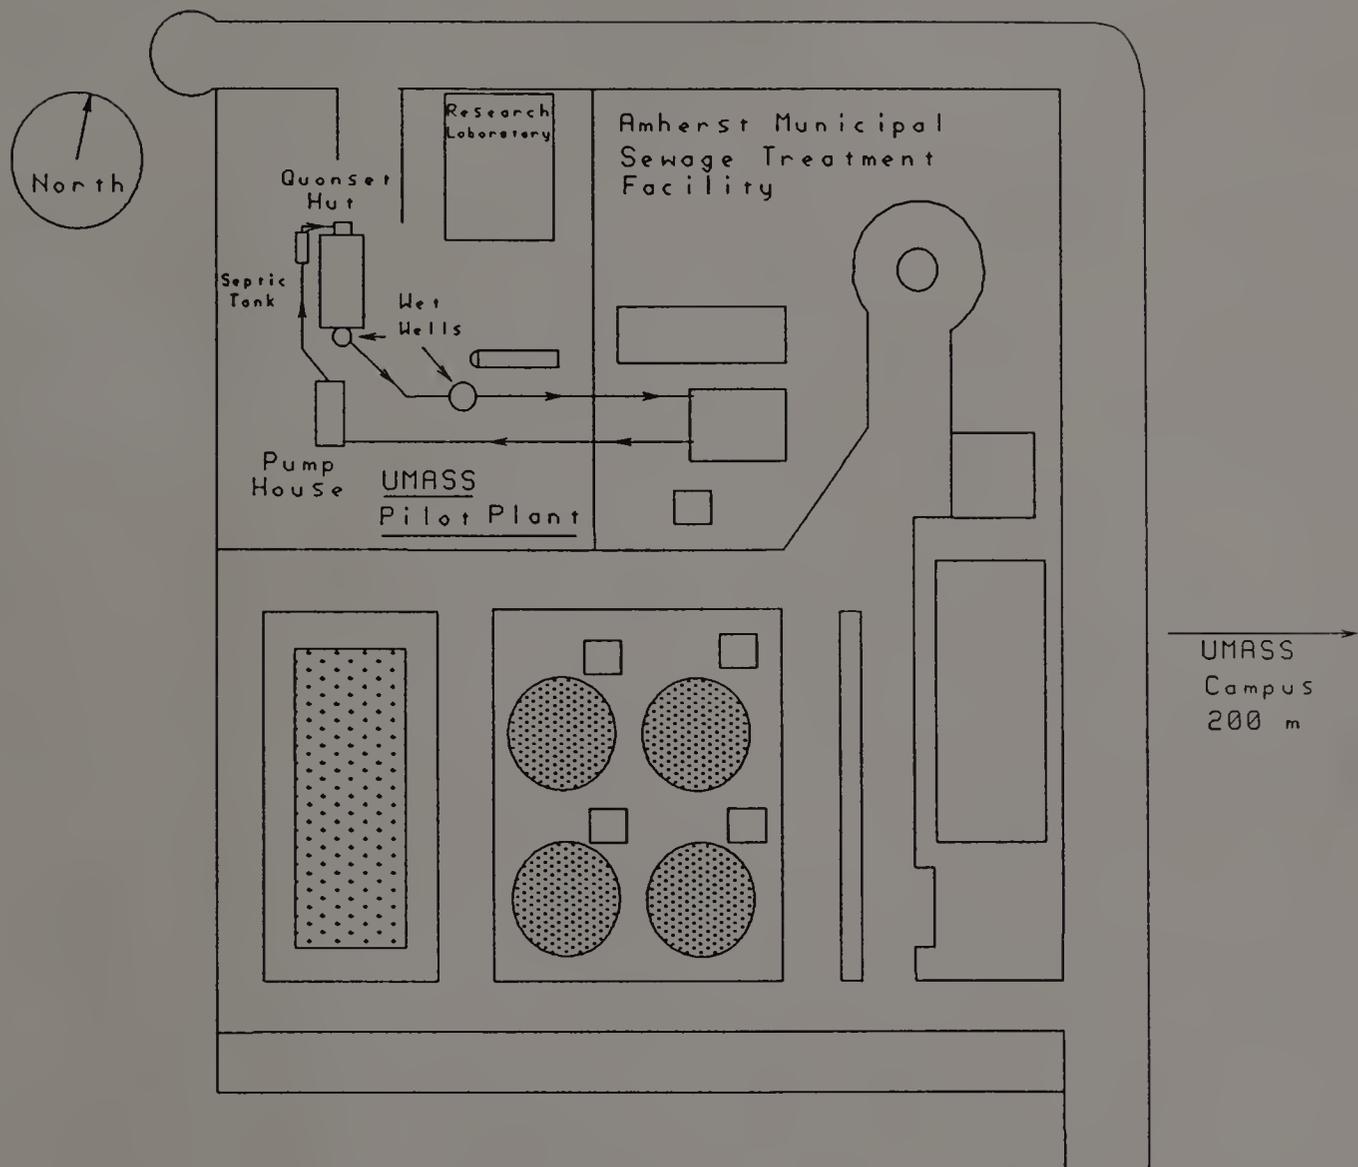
Plan view of University of Massachusetts Pilot Plant and Amherst Municipal Sewage Treatment Facility.
